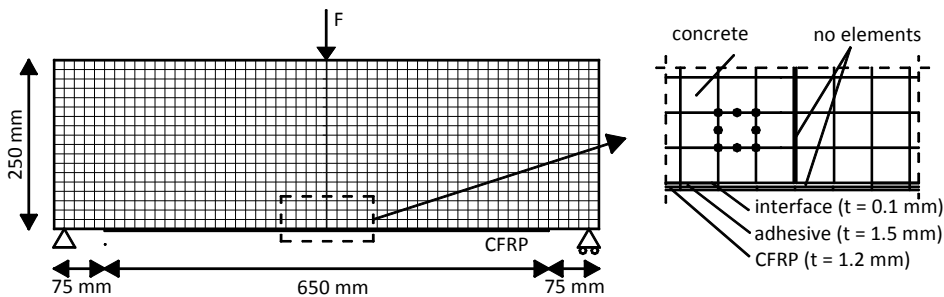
Finite element model for loading of the three-point bending test specimen
